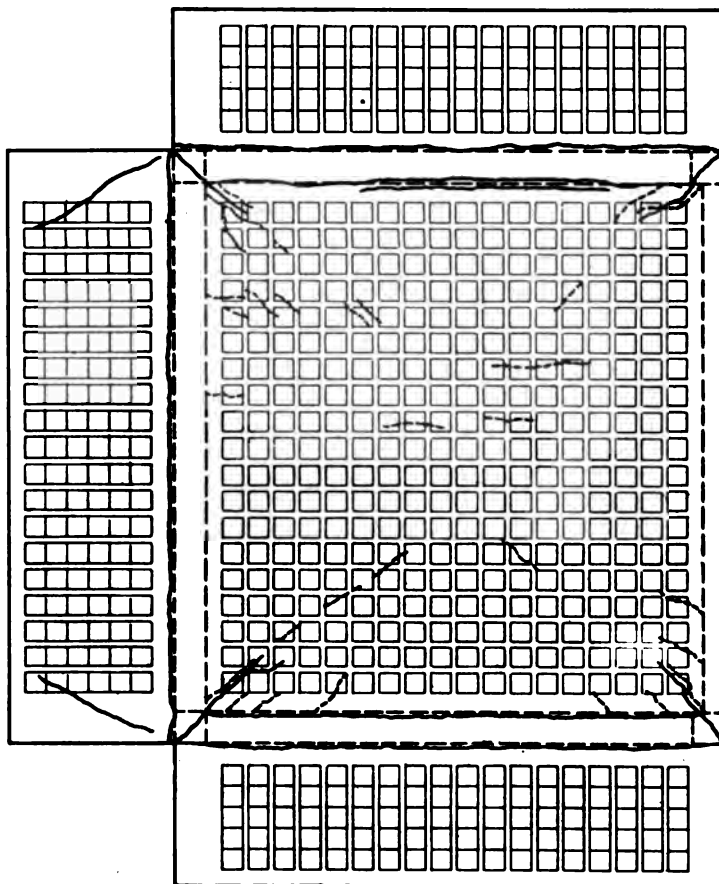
PLAN SHOWING LOCATION OF CRACKS.
